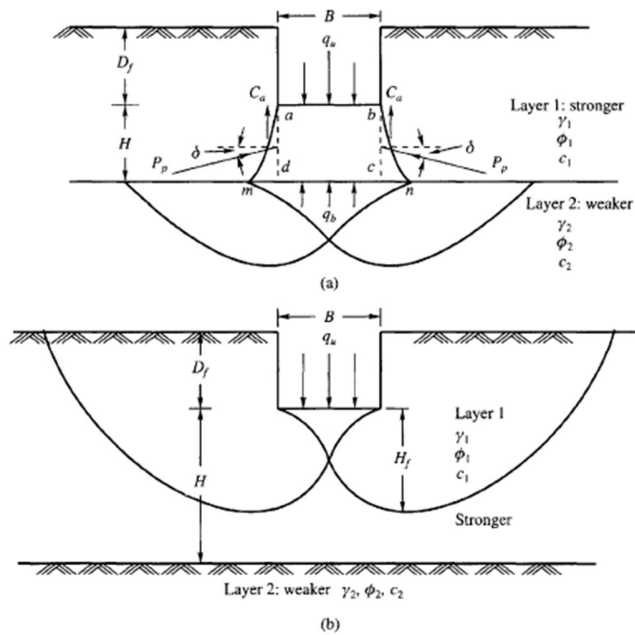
Failure of soil below strip footing under vertical load on strong layer overlying weak deposit (after Meyerhof and Hanna, 1978)
